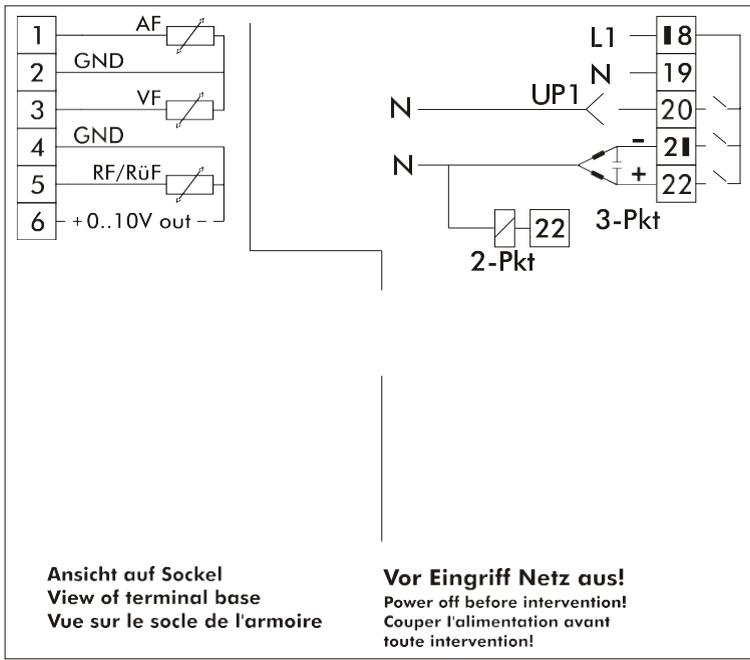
Connecting the EQJW126 Controller with standard back panel
